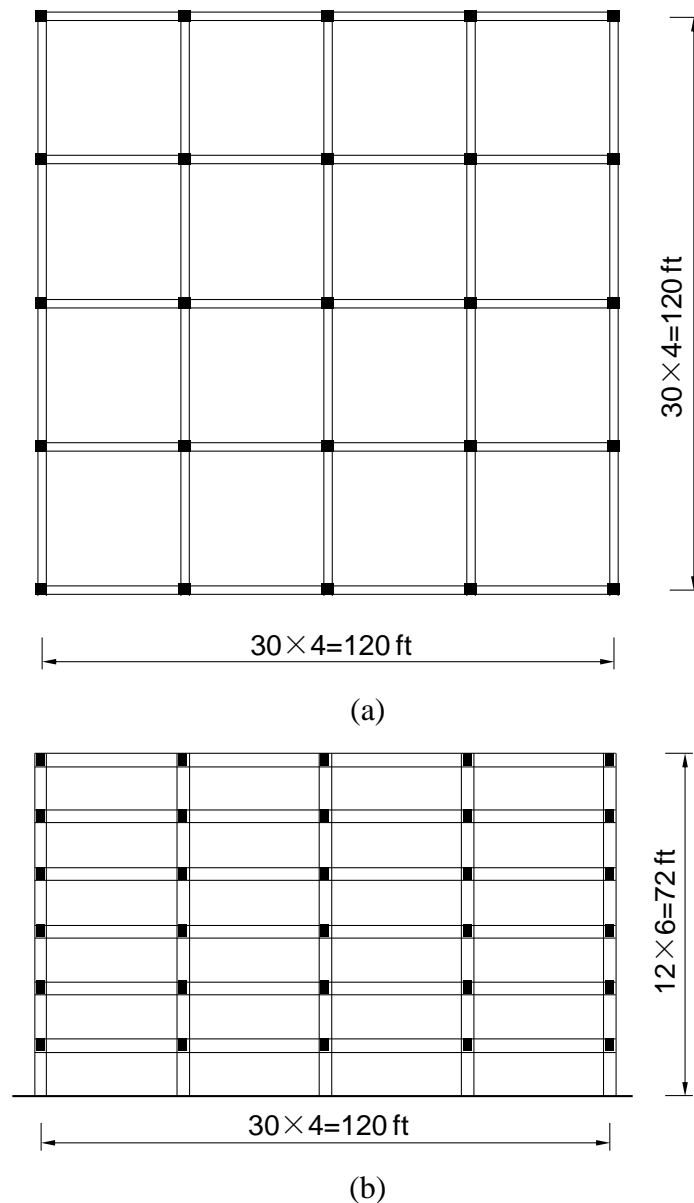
Prototype RC frame building: (a) floor plan; and (b) elevation plan
